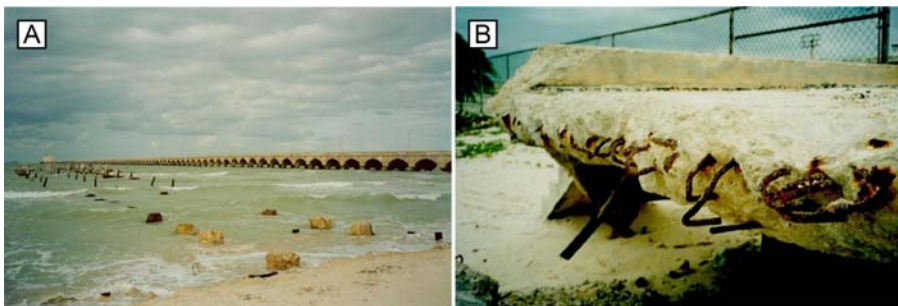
Concrete piers into the Mexican Gulf at Progreso, Mexico. From [Rambøll, 1999]. [A]: Perished carbon steel reinforced pier (opened in 1969) in the foreground and existing stainless steel reinforced pier (opened in 1941) in the background. [B]: Close up of remains of the deck of the carbon steel reinforced pier.
